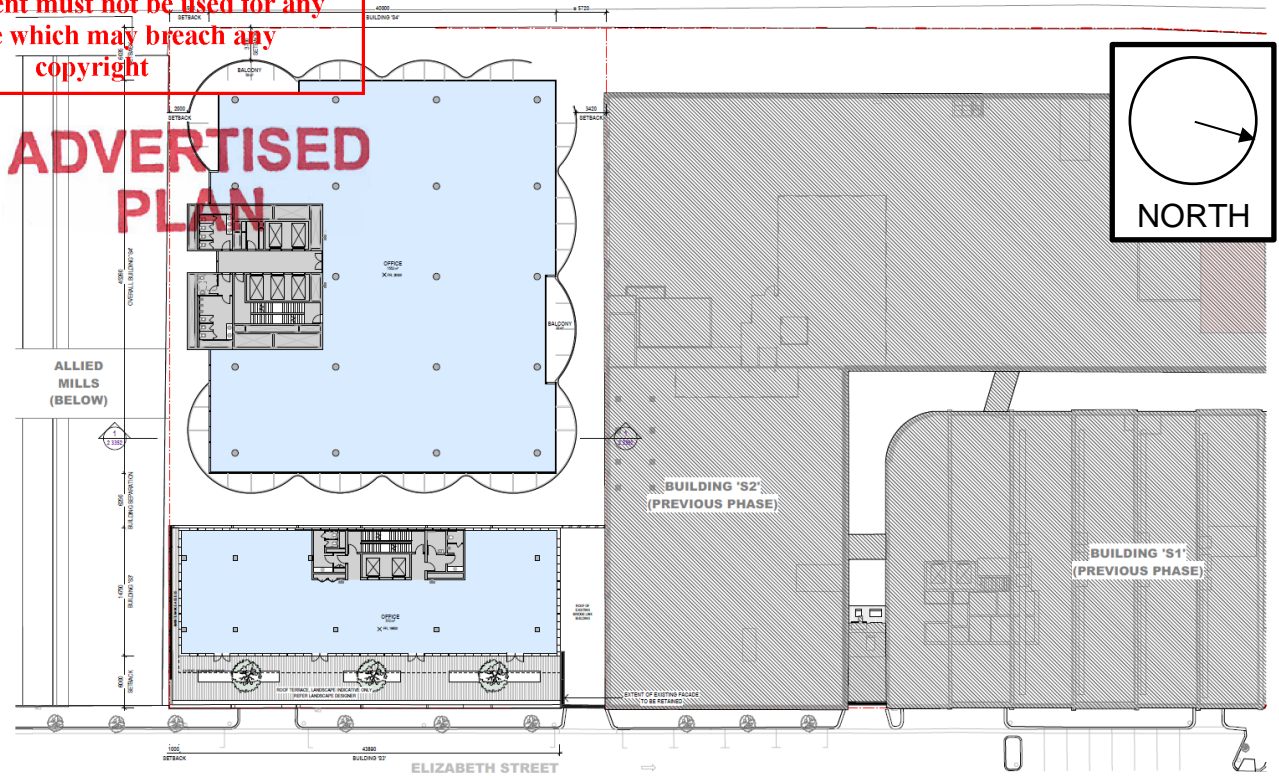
Level 2 floor plan of Stage 2 of the proposed 2-50 Elizabeth Street development
